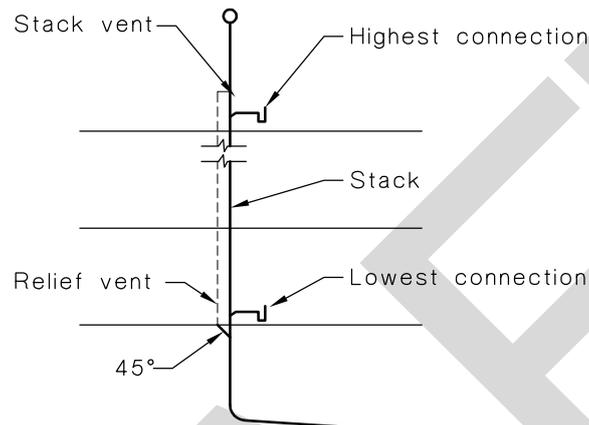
TYPICAL RELIEF VENT INSTALLATION
